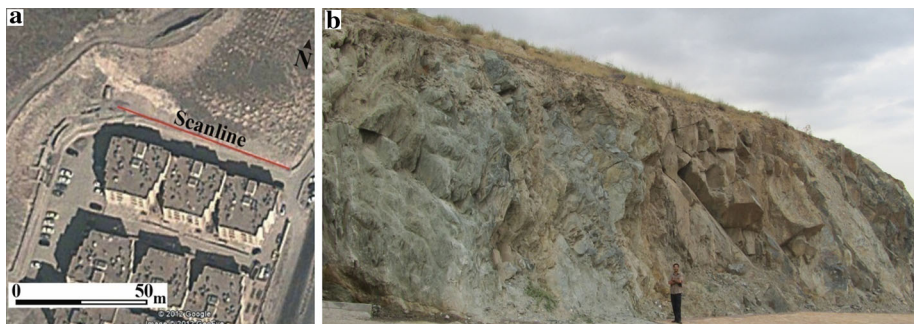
Overview of the residential complex (a) and vertical trench before the construction of the buildings (b) (north view)
